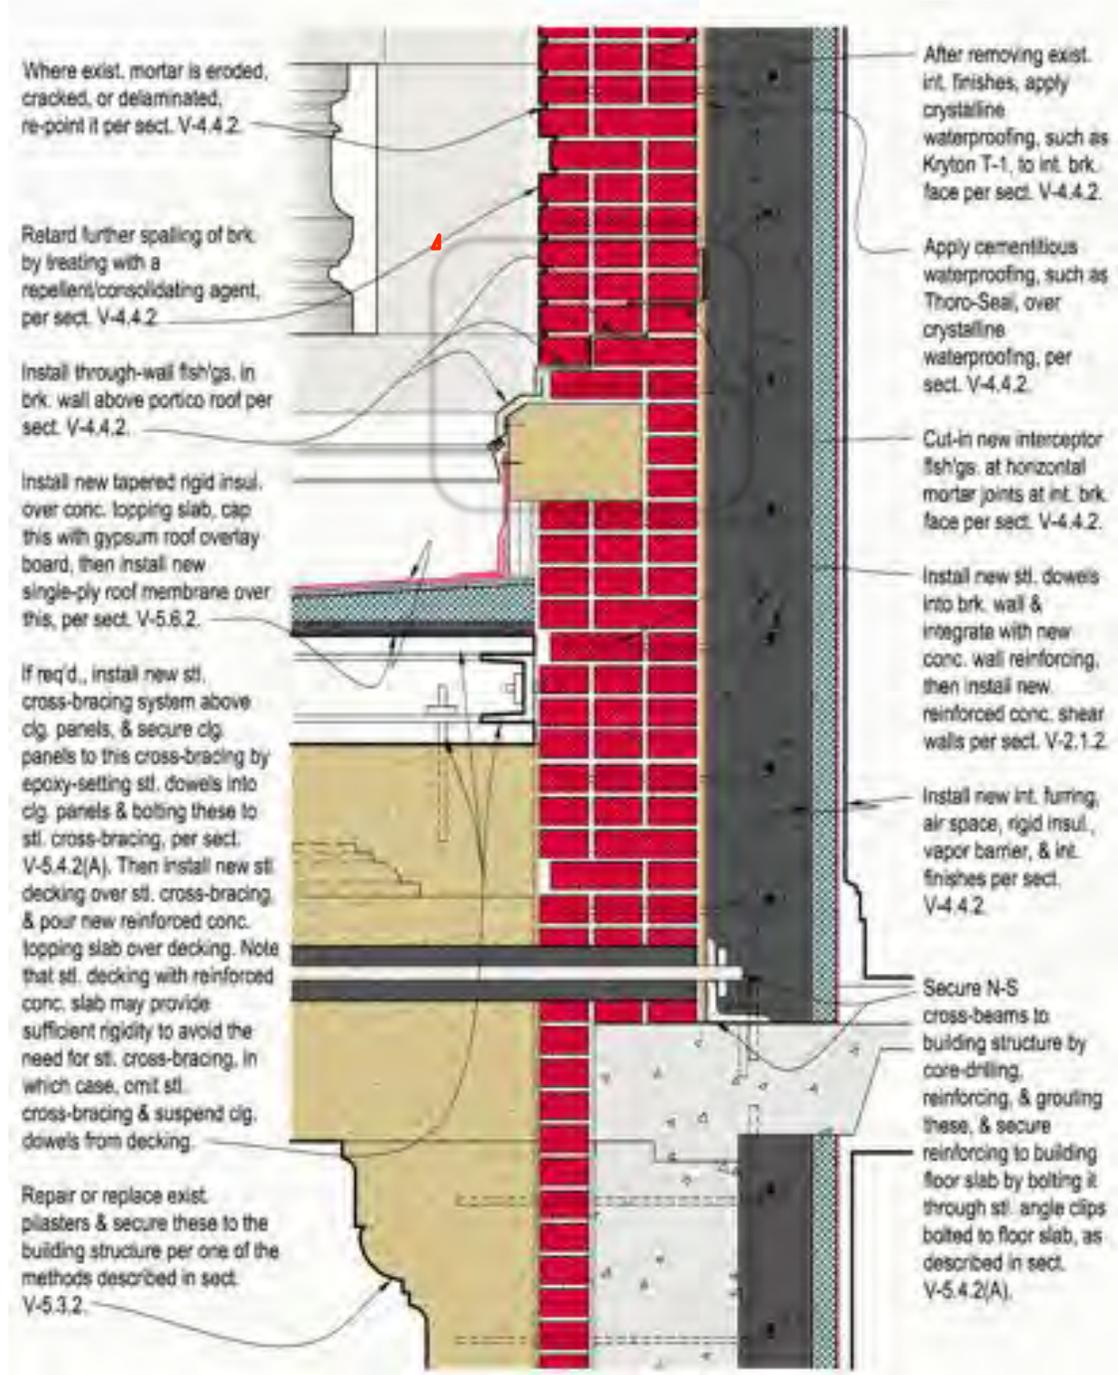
(4): Retrofitting of Through-Wall Flashings Above Portico Roof
